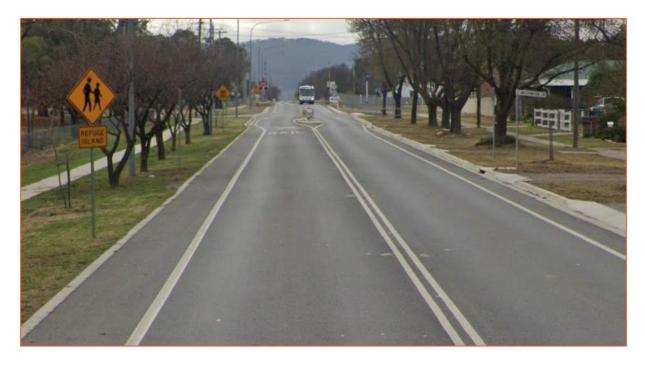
Kings Highway Looking East Towards Majara Street (source: Google Streetview)
